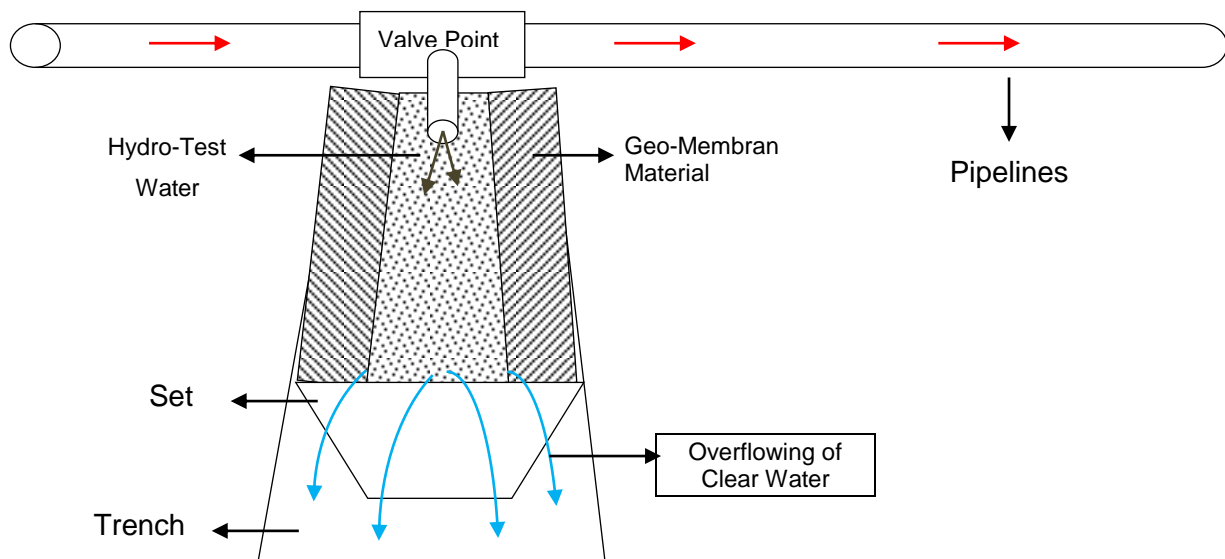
Example Hydrotest Drain Trench Plan
